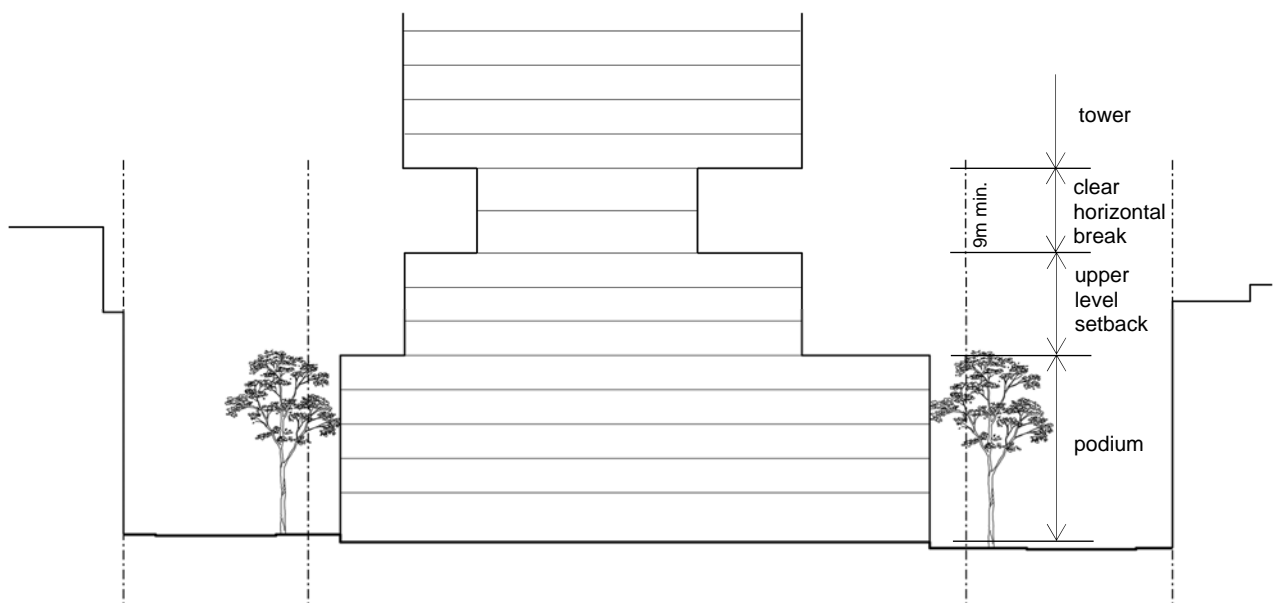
cross section showing the 'wind void' storey providing a clear horizontal break in the tower form to manage wind impacts
